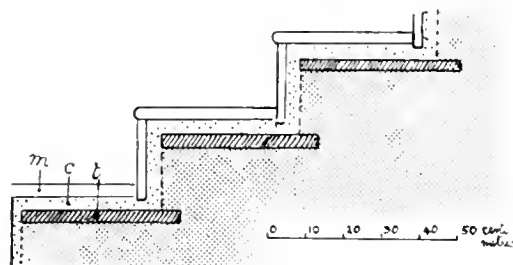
SECTIONAL ELEVATION OF STEPS.
